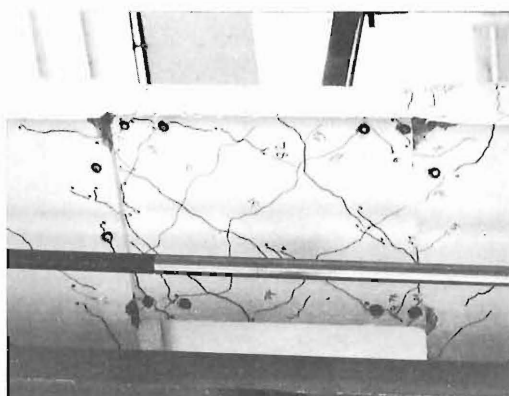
CRACK PATTERNS OF SHEAR WALL A
